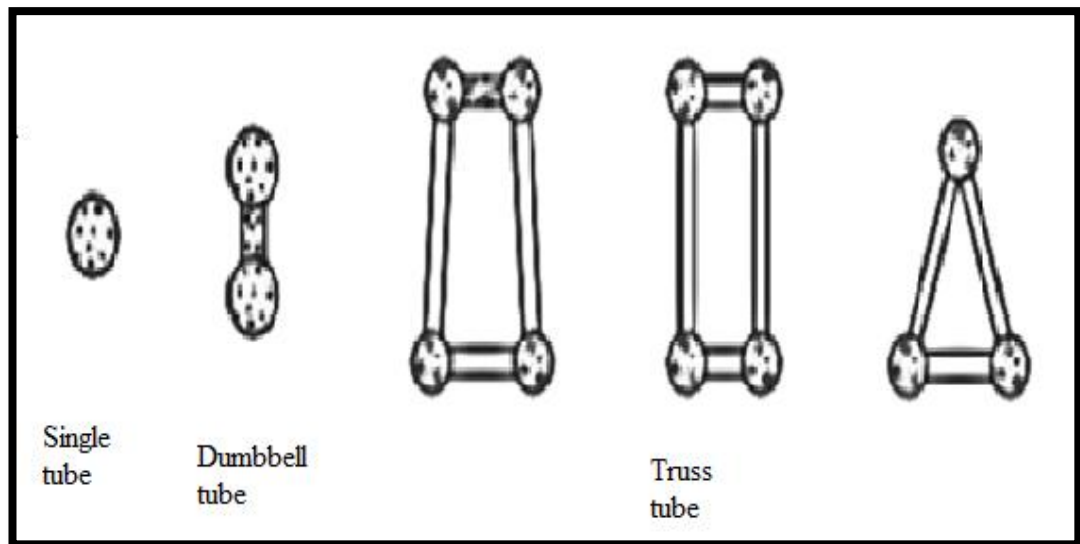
Cross – sectional type of CFST arch rib (Chen and Wang, 2009)
